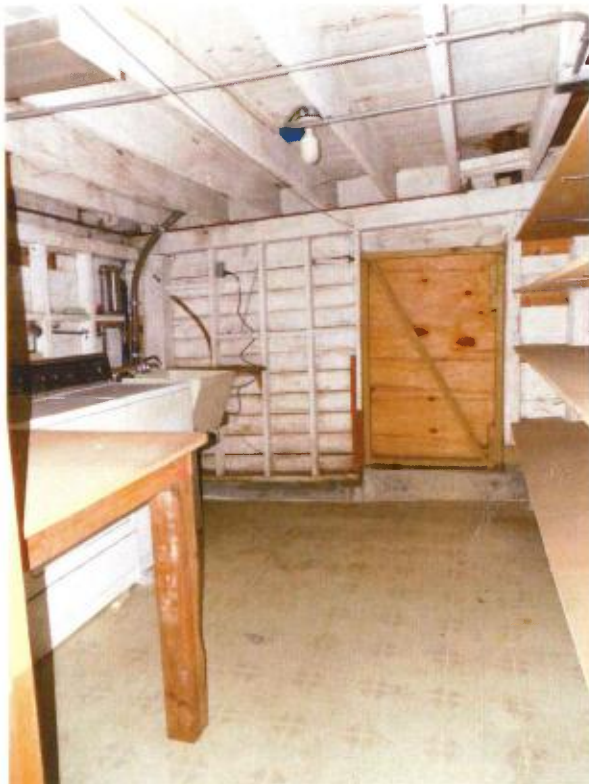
The laundry room is located underneath the kitchen addition at the back of the building. The headroom varies from 6'-2" to 6'-5".
